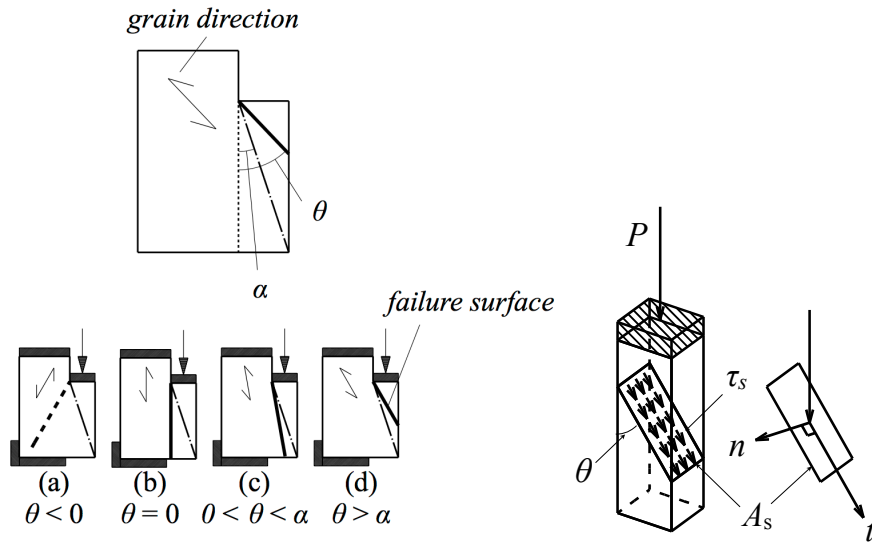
Definition of angle α . Failure of shear test specimens.
